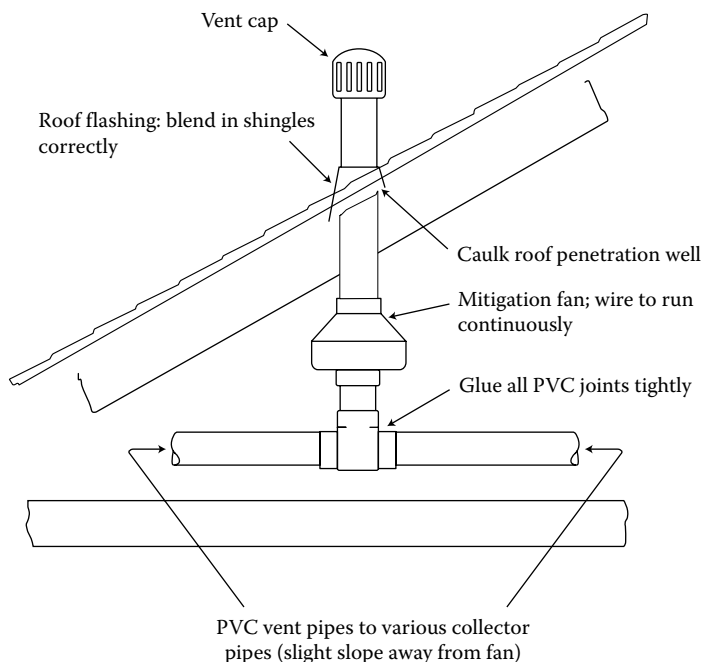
Schematic of the fan placement and roof penetration of a typical installation. (Adapted from U.S. EPA, *Sub-Slab Depressurization for Low-Permeability Fill Material—Design and Installation of a Home Radon Reduction System*, EPA/625/6-91/029, U.S. Environmental Protection Agency, Washington, DC, July 1991.)
